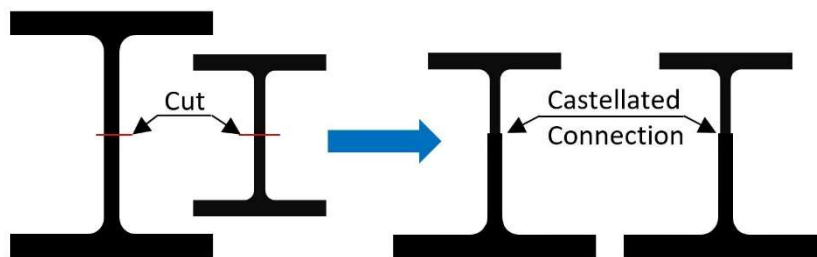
Kloeckner Westok® ultra shallow floor beam USFB®
